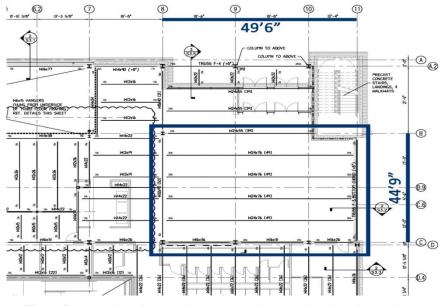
Second floor framing plan, representative bay of a typical frame, from S2.0
